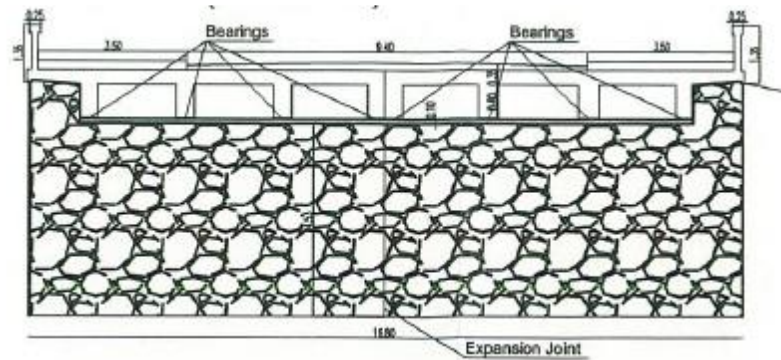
Longitudinal view of interior wall and cross section of deck slabs (Section 1-1)
